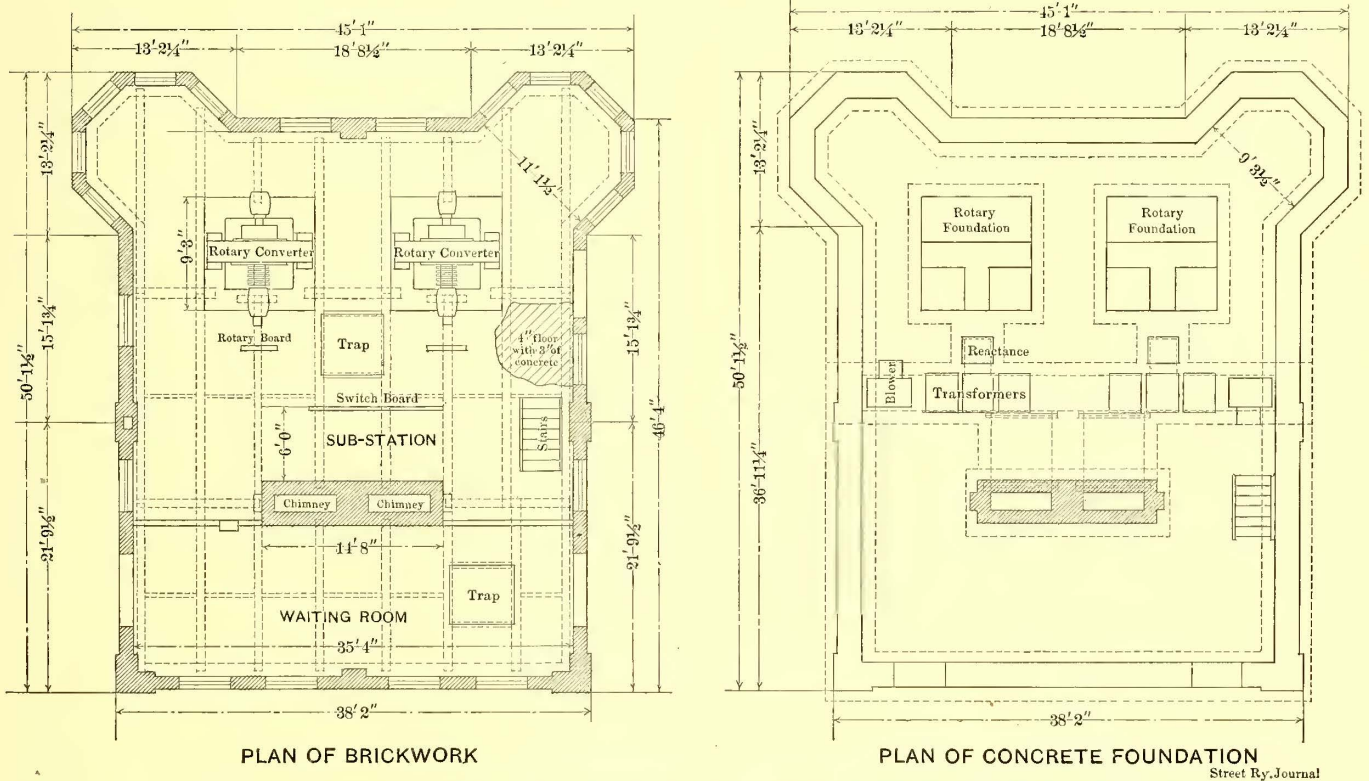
BRICKWORK AND FOUNDATION PLANS OF CLEAR CREEK JUNCTION SUB-STATION
